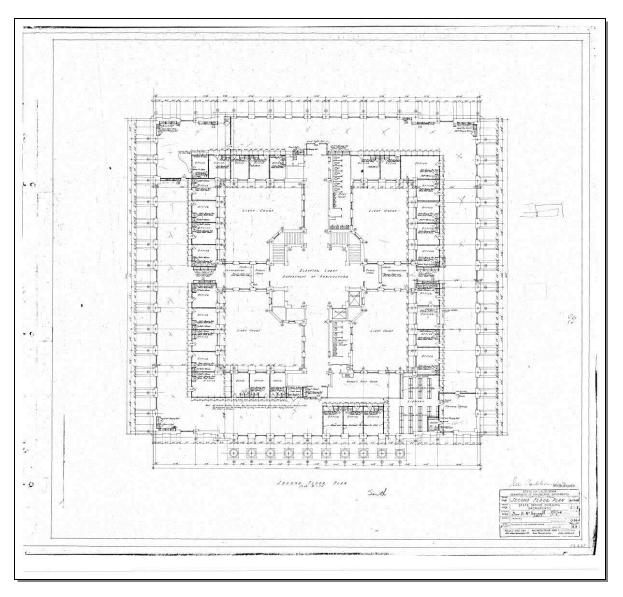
OB 1 Second Floor Plan. April 20, 1926.
